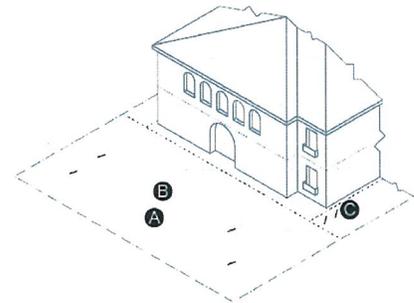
The “front yard-facing building plane ‘B’ shall be offset by a dimension of ‘C’ from other front yard-facing building planes and shall not exceed 80% of ‘A’, the length of the Maximum Potential Facade at the front setback line.
